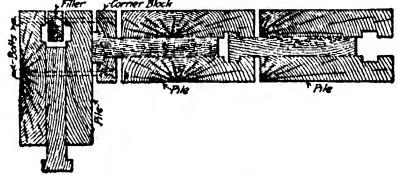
Interlocking Wood Sheet Piling.
